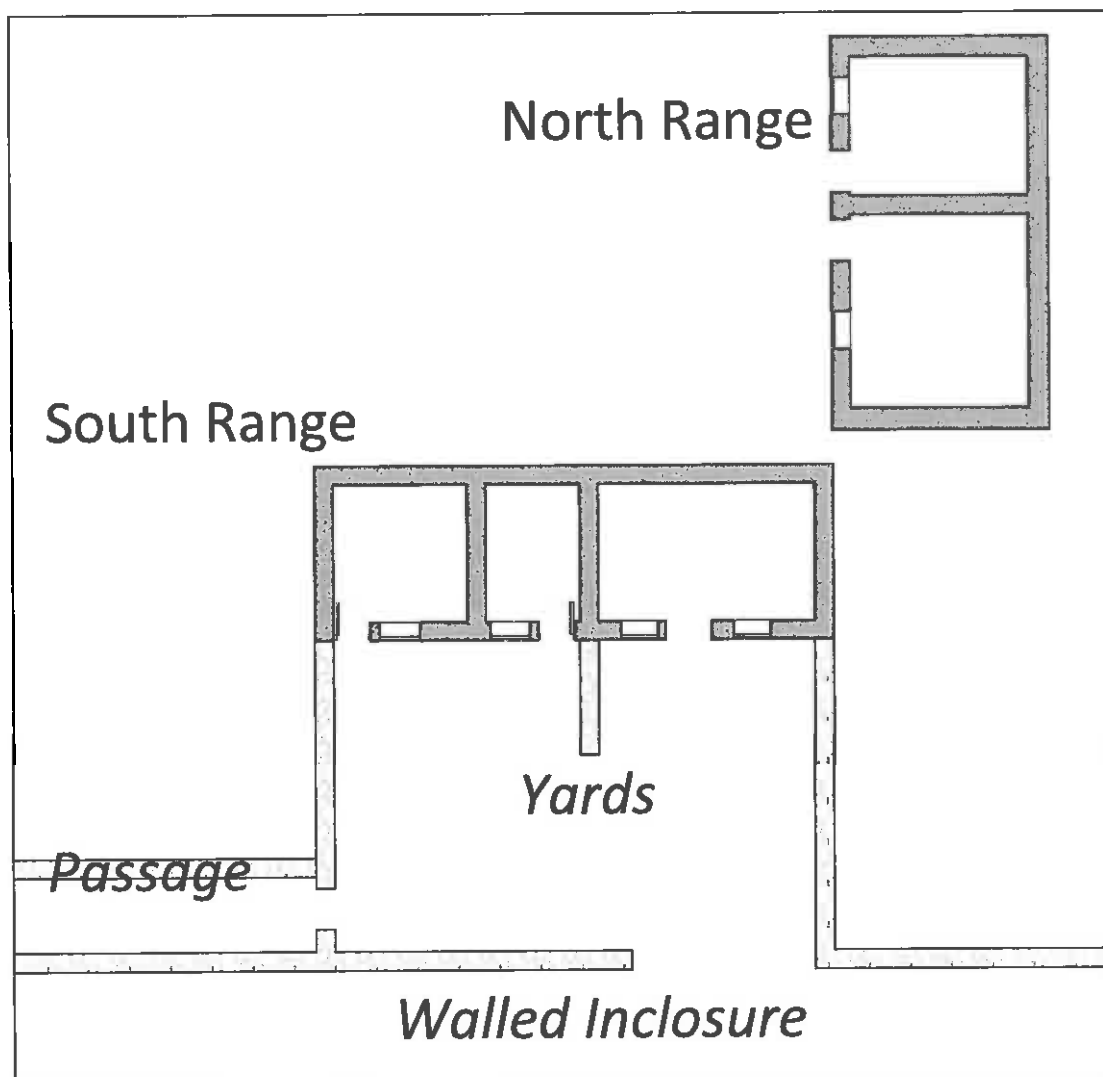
Plan of the buildings (Peter Hitchen Architects, Whalley).
